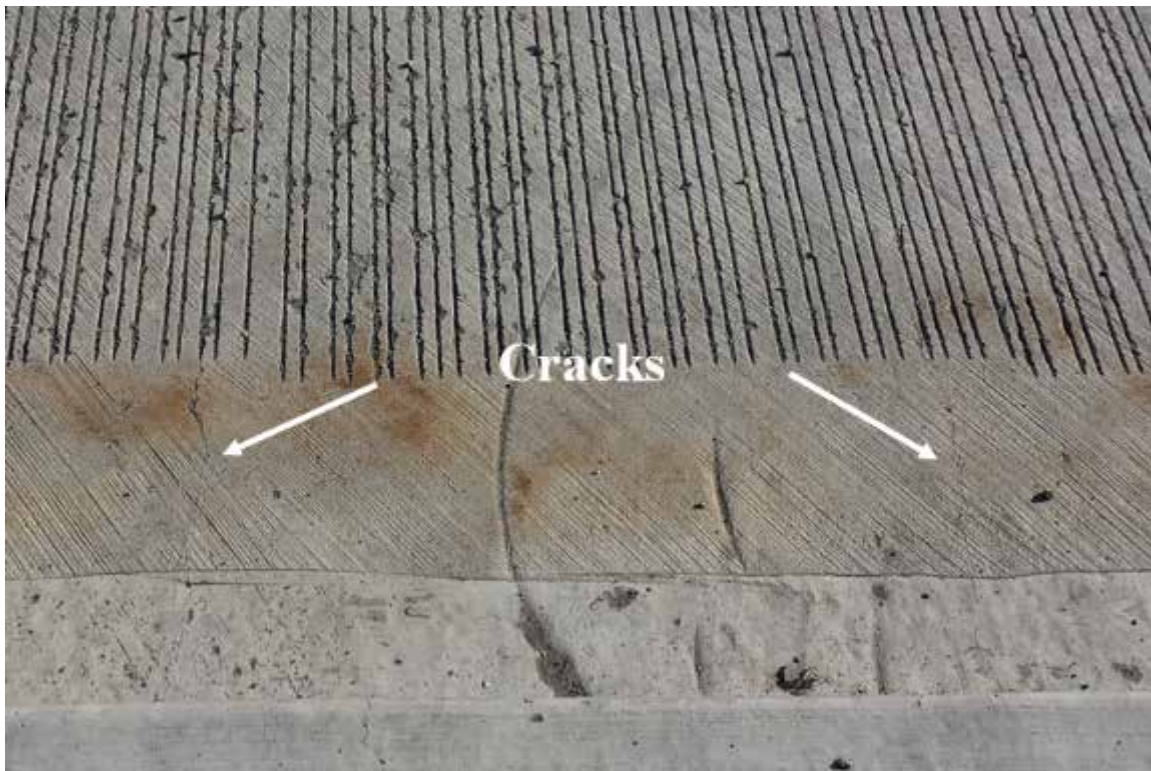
Collings Ave Bridge Deck Cracking
